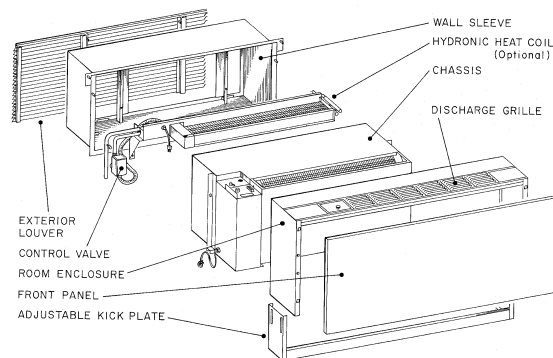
Packaged Terminal Air Conditioner with Separate Heat Section and Cooling Chassis
